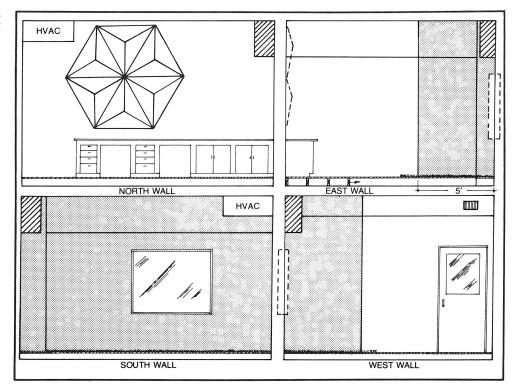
Wall elevations of Control Room A showing distribution of absorbing material and the diffusing element on the north wall.
